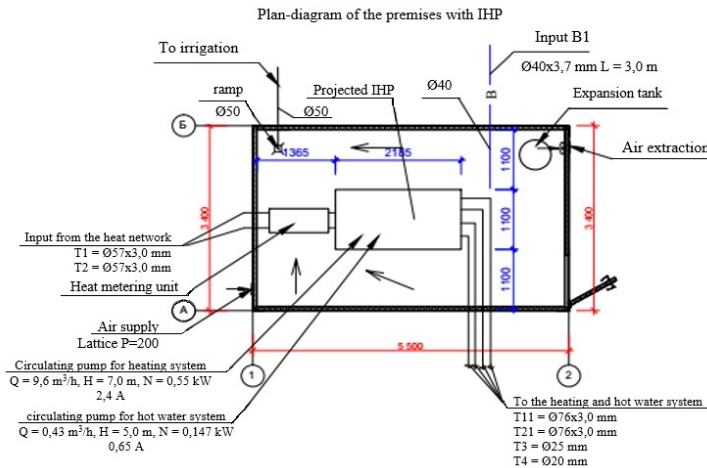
Plan for placing an individual heat point in a residential building in the city of Bukhara.
